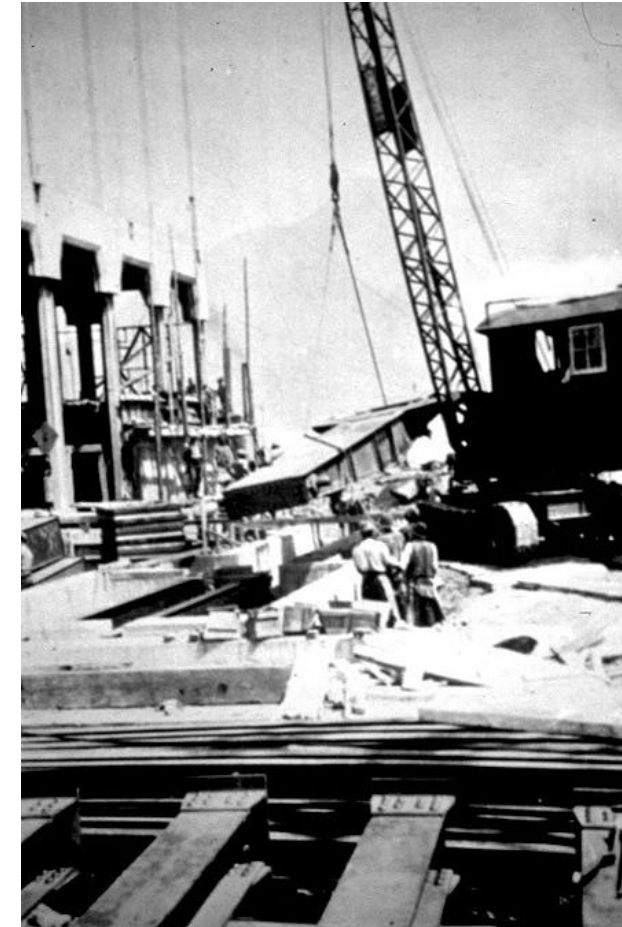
Building the track shed - placing tipping platform in position²³ (ref: DW0196)
